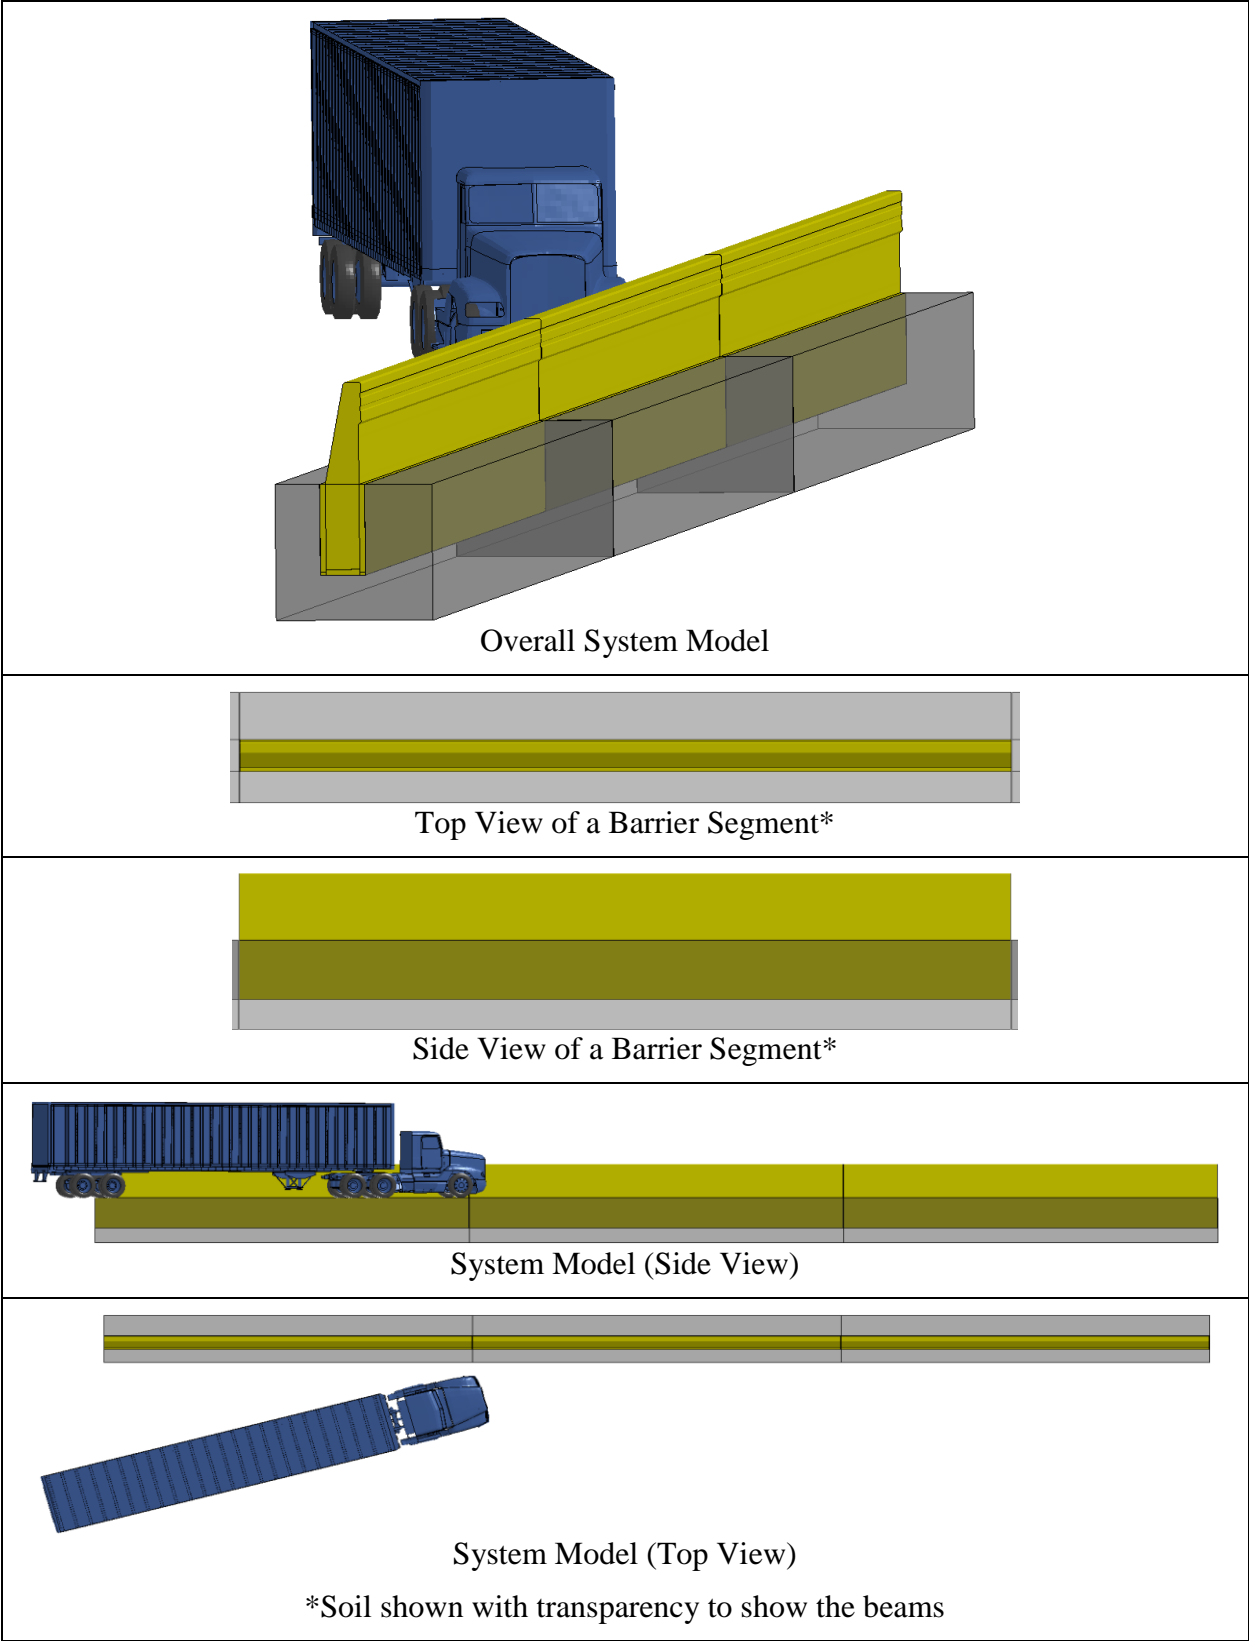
Preliminary Concrete Beam Foundation Simulation Model Details
